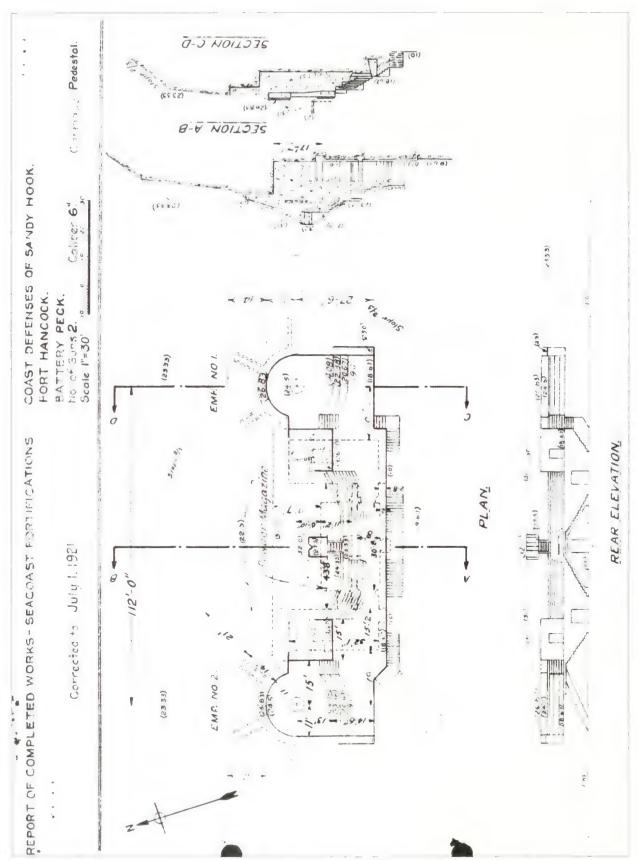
Plan, elevation, and sections of Battery Peck 1921. Soldiers accessed Battery Peck's guns by steps that led to an intermediate platform and then additional steps that proceeded up five and a half feet to the gun platforms. The battery's magazines were located below this built-up structure and accessed from the ground level through one of three doors (Report of Completed Works, CDSG ePress).
